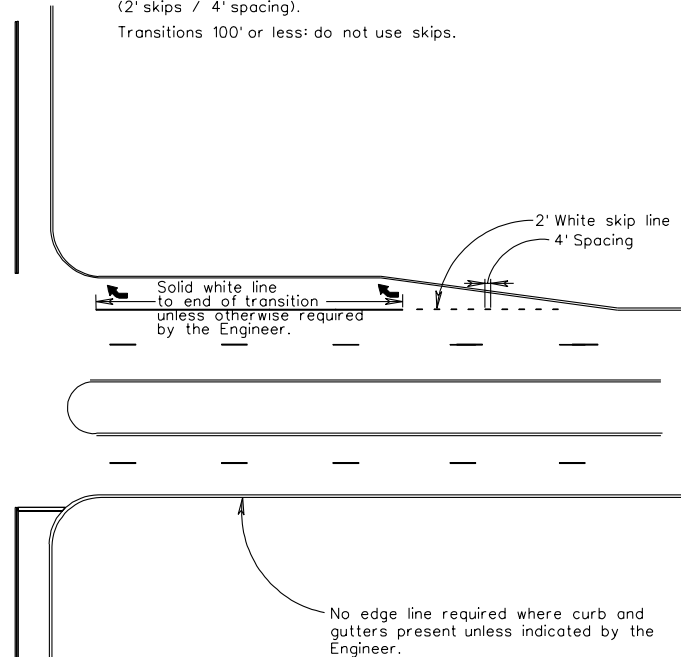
DETAIL FOR LOCATION OF EDGE LINES ON CURB SECTIONS OF ROADWAY (NO GUTTER)
